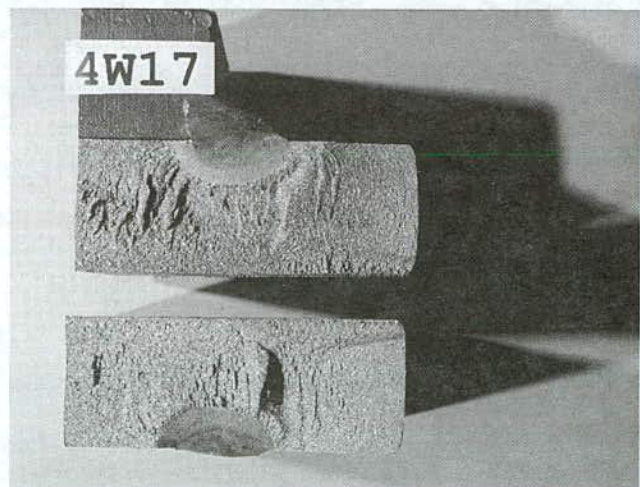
Fatigue crack at ground weld end detail 4W17.
